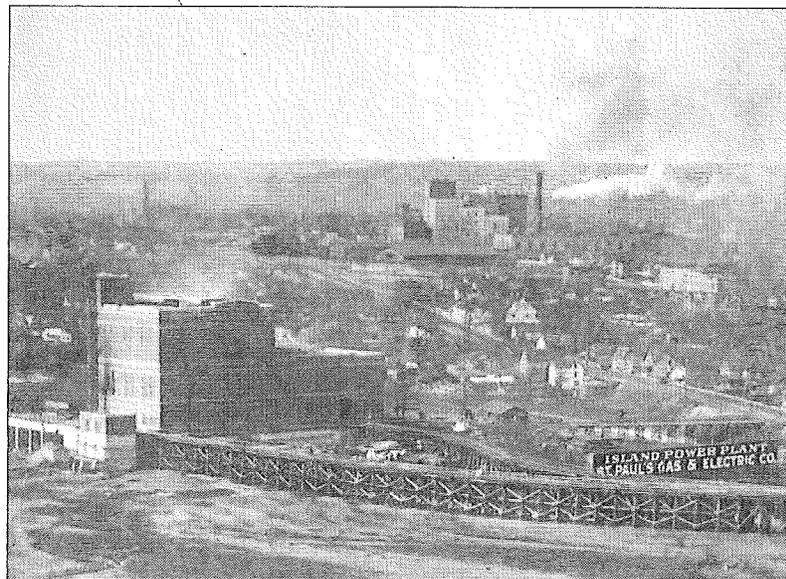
Island Power Plant Station construction, looking northwest, ca. 1924. (NWAA)
